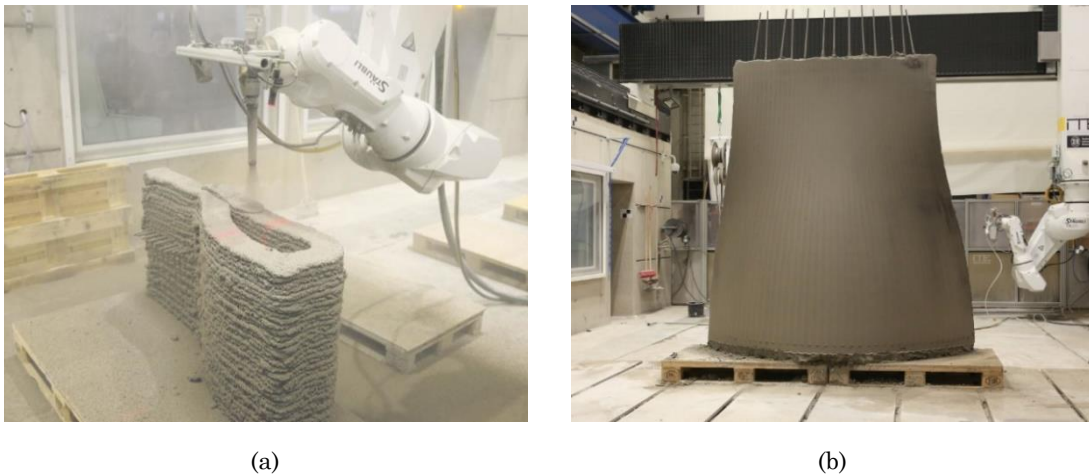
Extruded concrete 3D printing for different implementations: (a) tailor-shaped columns; (b) cantilevering shell structure (photo credit: (a) Axel Crettenand; (b) (Sakagami et al., 2020)).
